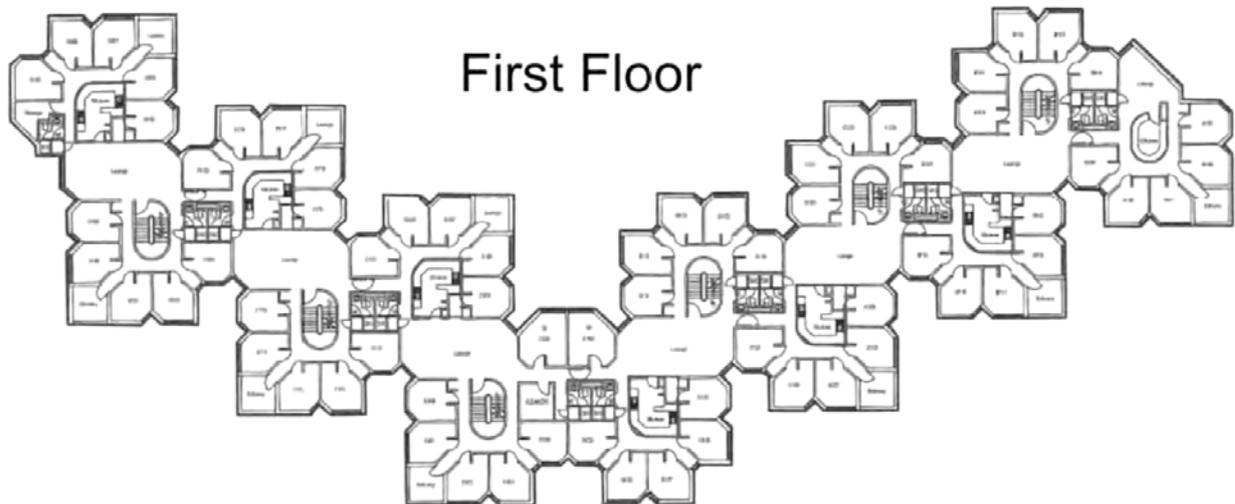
First floor plan of Toad Hall displaying flower petal clusters of student rooms branching out from a central kitchen and common room. The second and third floors follow a similar plan. Source: ANU 2011
